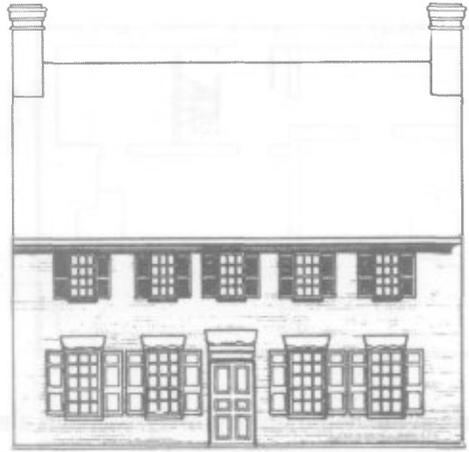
Mistake house, west elevation, c. 1725. (Long, "Historic Structure," 112.)
